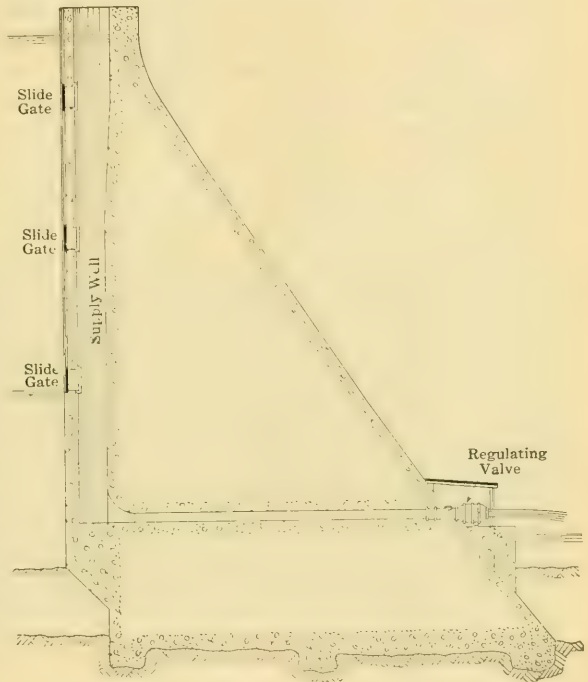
Typical Arrangement of Johnson Regulating Needle Valve to Storage Reservoir Outlet.
